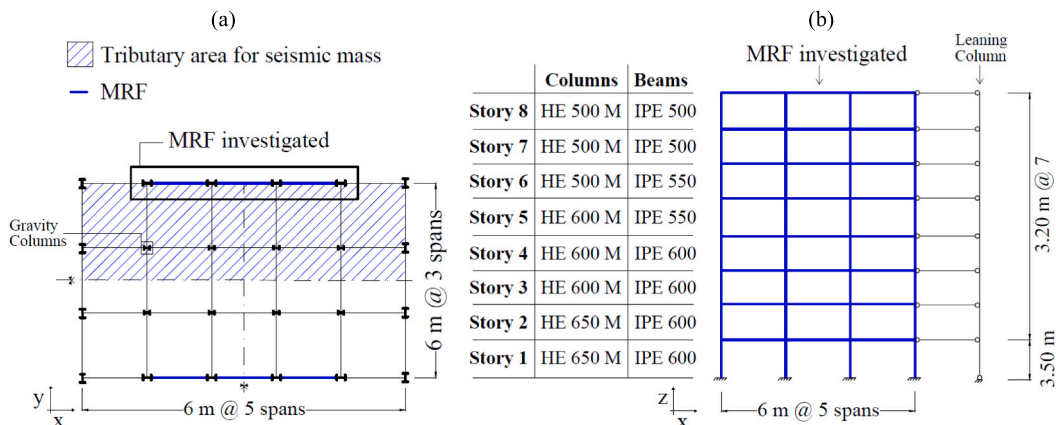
Case study structure. (a) Plan view. (b) Elevation view with columns' and beams' cross-sections (Adapted from Pieroni et al. [40]).
